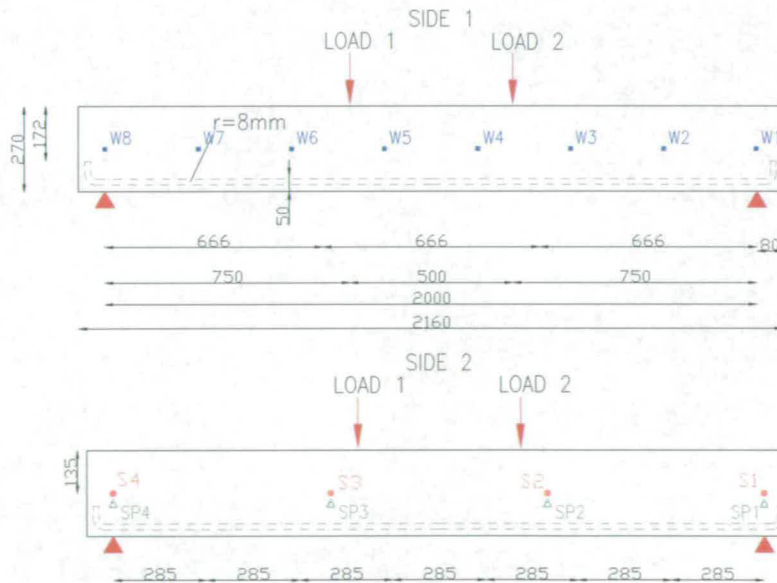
Design details, test configuration and sensor location (resonant: S1 to S4 - broadband WD type: W1 to W8 - SoundPrint: SP1 to SP4) of beam BF2c.
